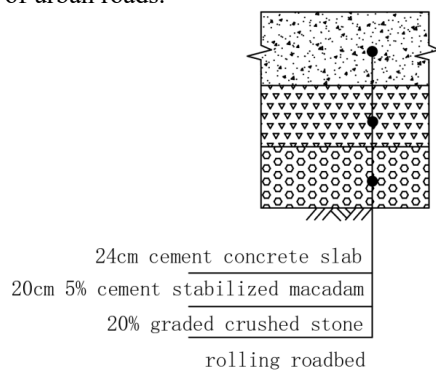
Structural diagram of traditional road (taking cement concrete surface course as an example)
